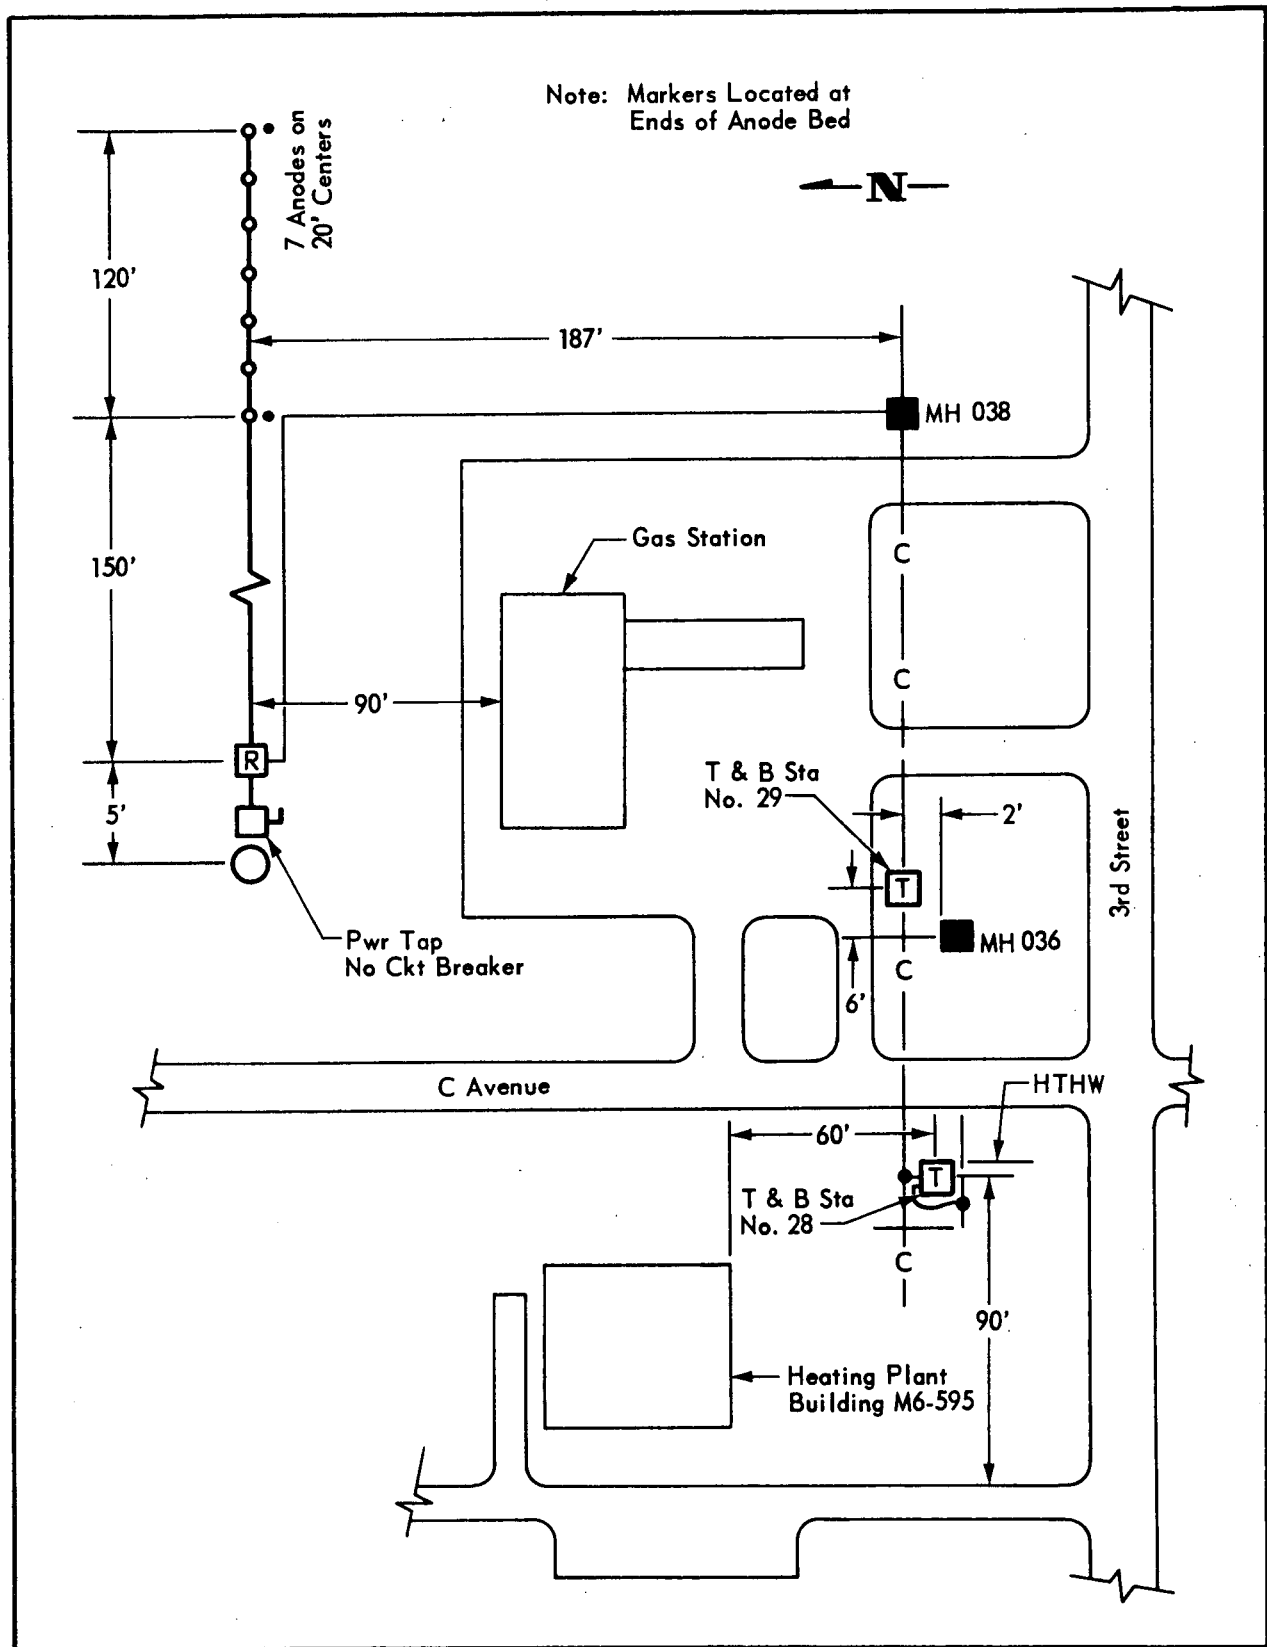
Site No. 30 and Test and Bond Stations No. 28 and 29
